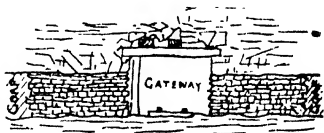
Face-road (or Gate-way, &c) with Roof ripped down to make Height
